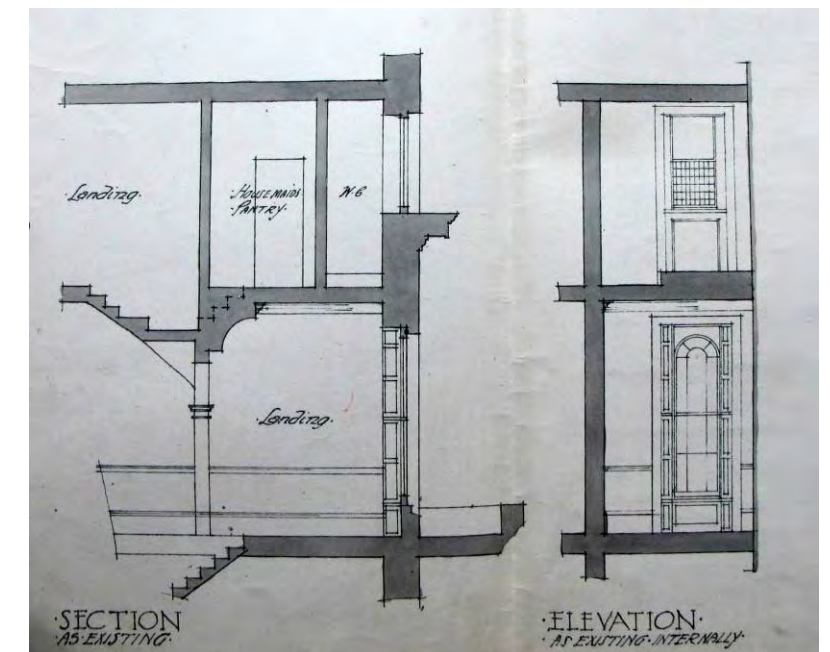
1925 – Existing section of the stairs/landing between the first and second floors.
